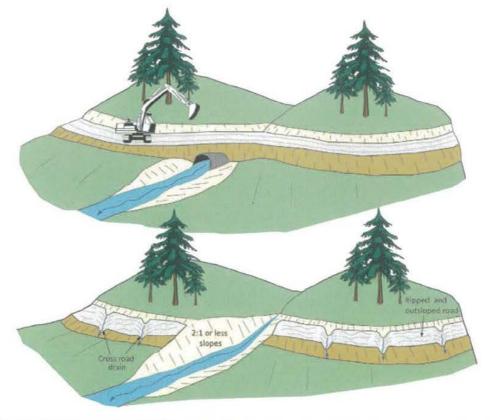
On roads that are to be closed (decommissioned), all stream crossing culverts and fills should be removed. Stream crossing excavations are best performed using an excavator. The original channel should be excavated and exhumed down to the former streambed, with a channel width equal or greater than the natural channel above and below the crossing. Sideslopes should be laid back to a stable angle, typically a 2:1 (50%) gradient, or less. Spoil can be endhauled off-site or stored on the road bench adjacent the crossing, provided it is placed and stabilized where it will not erode or fail and enter the stream.
